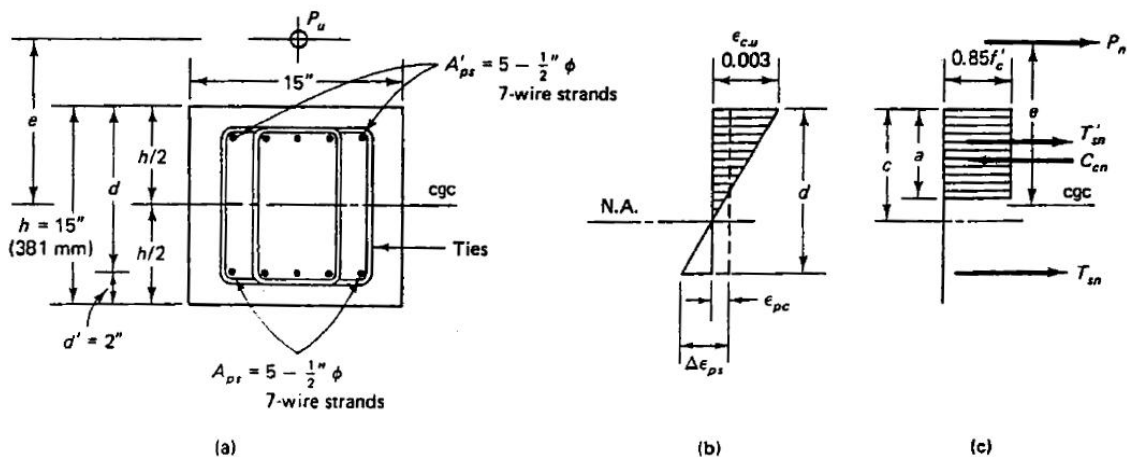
Proposed column section geometry in Example 8.2. (a) Cross-sectional details. (b) Strain distribution. (c) Stress block and forces.
